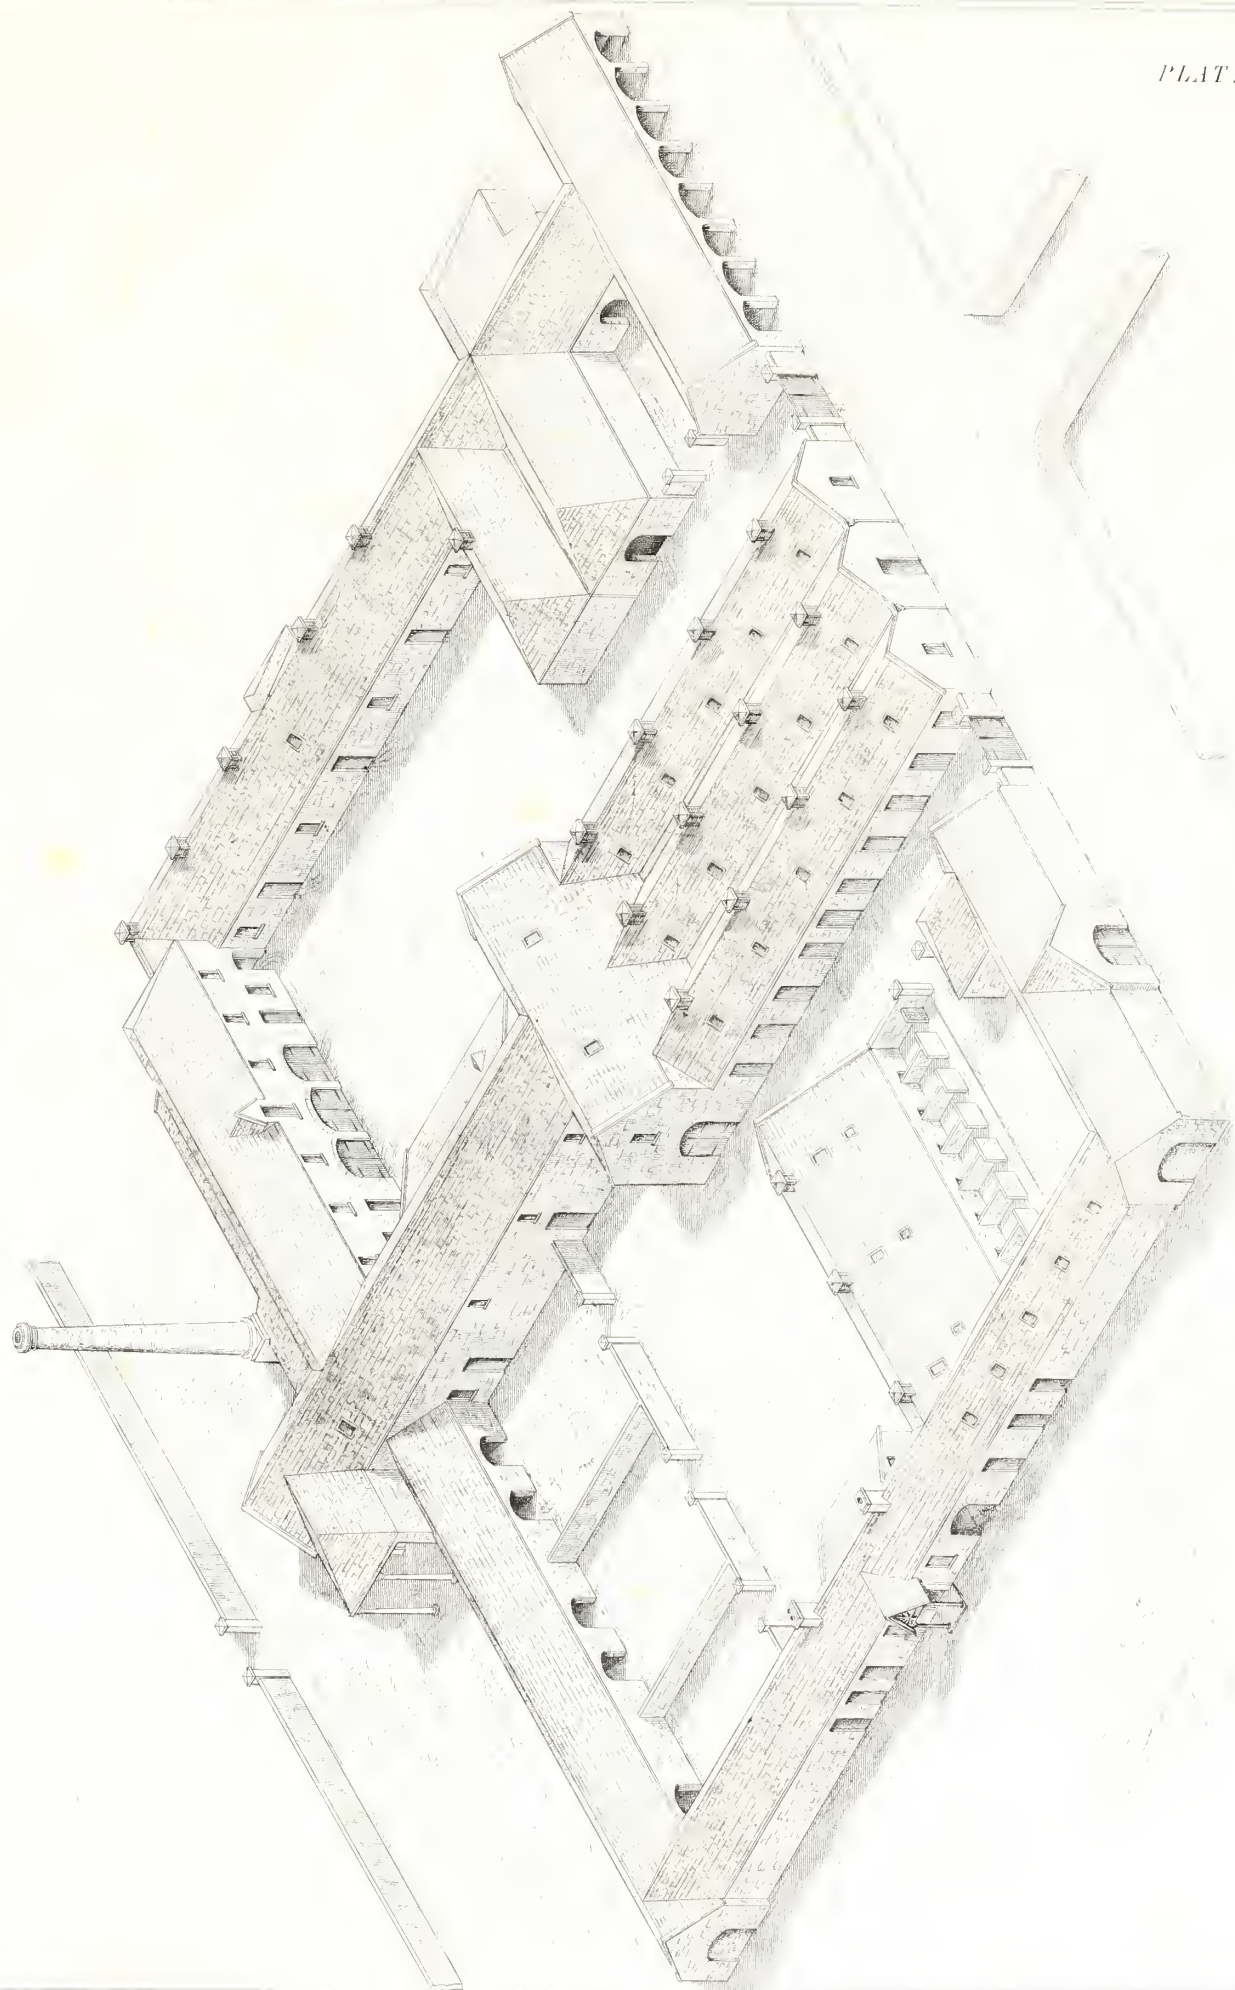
PLATES LVII. TO LIX.—DESIGN FOR A FARM-STEADING. No. 5.
